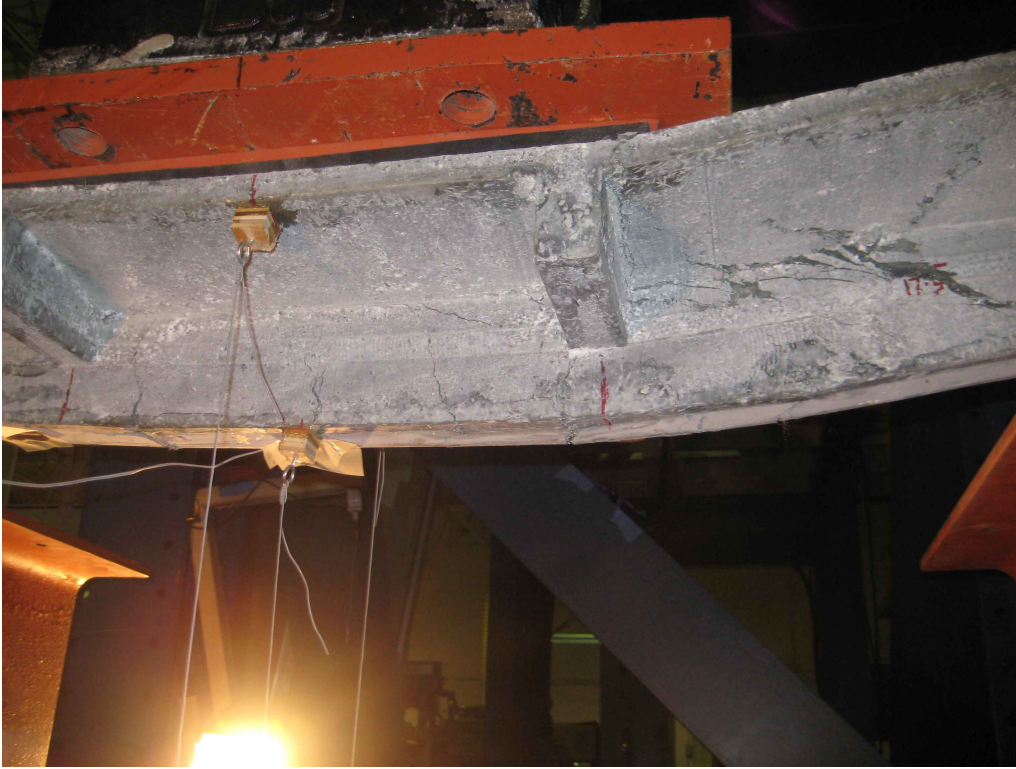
Flexural and Shear Cracks in Specimen 1T1S with Tapered Flange
